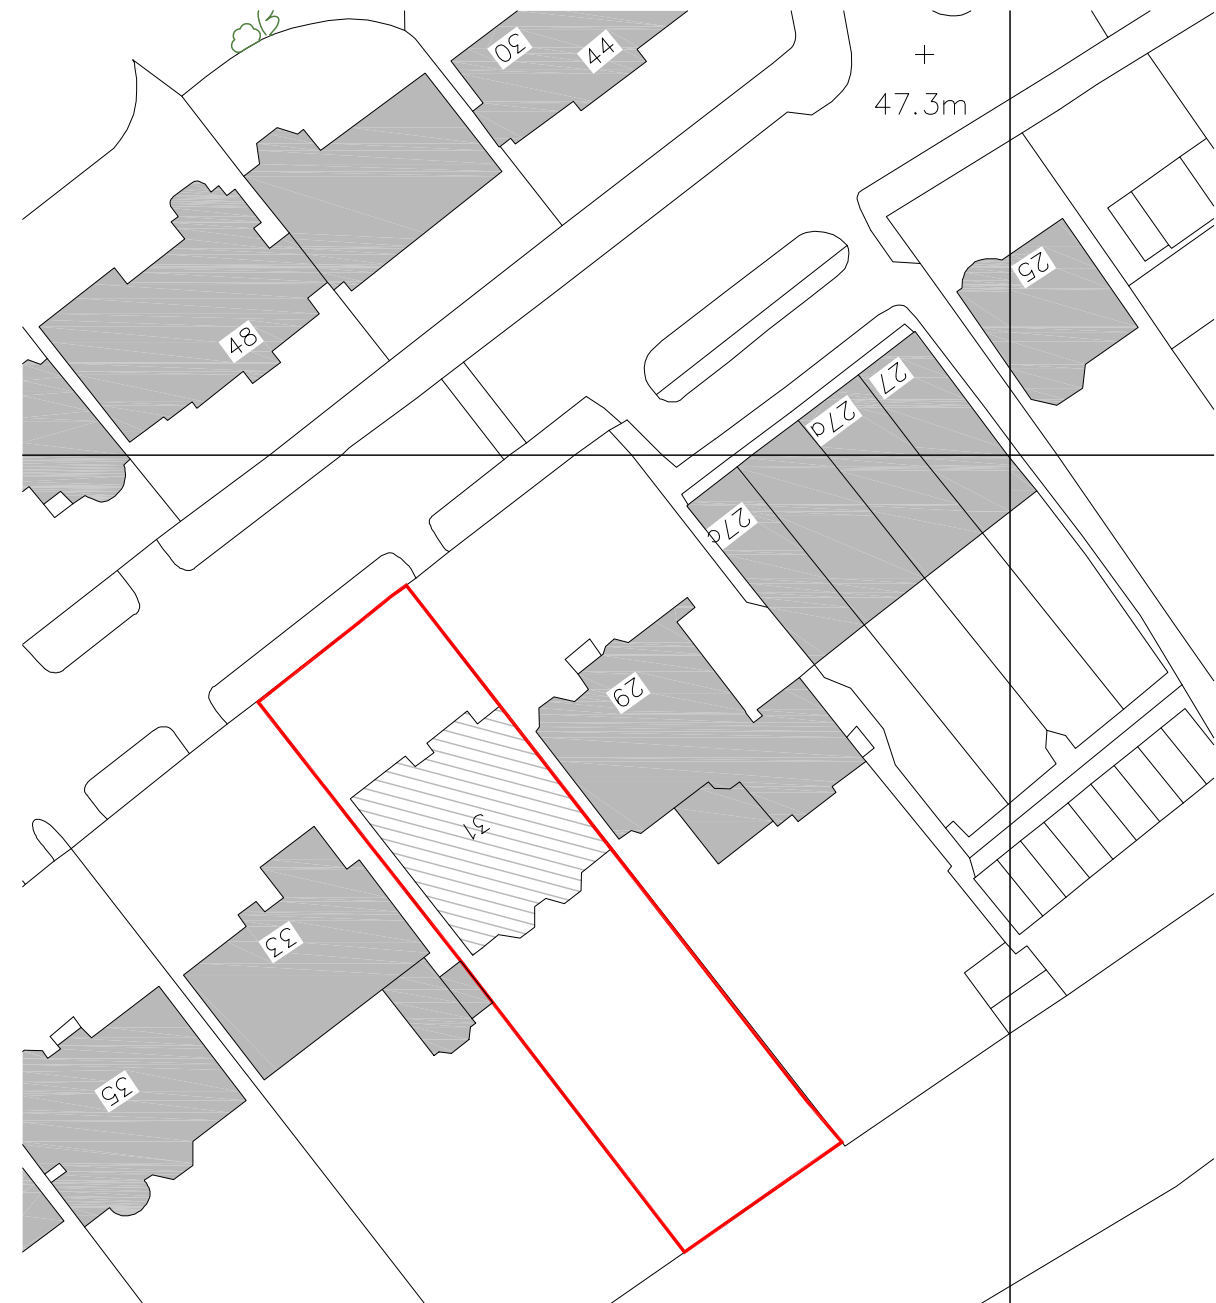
EXISTING SITE PLAN SHOWING THE PROPOSED SITE IN RED
